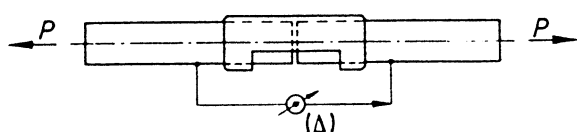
Test apparatus for tensile testing of sleeve couplers
